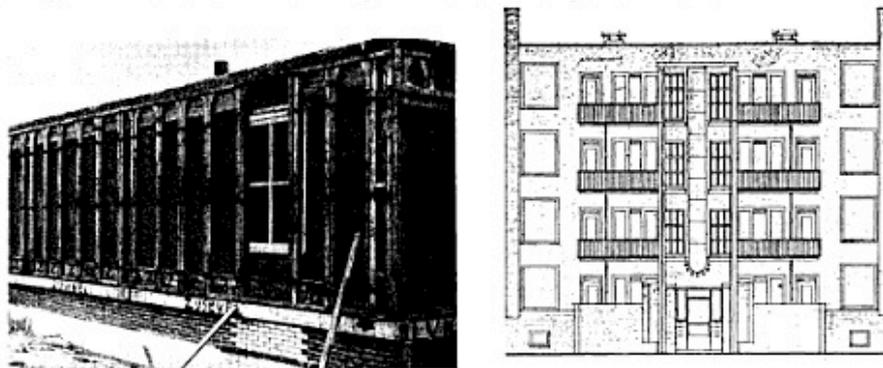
(left): Korrelbeton, standardized shuttering for outer wall (5). Figure 14 (right): façade of a building block completed in Korrelbeton with a single layer concrete façade.
